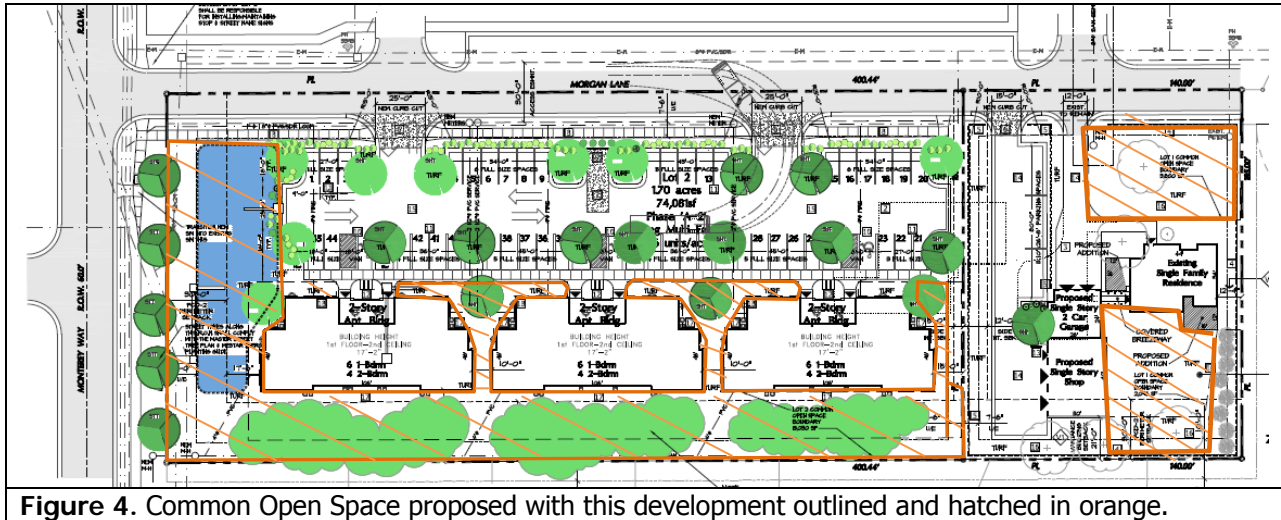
Common Open Space proposed with this development outlined and hatched in orange.
